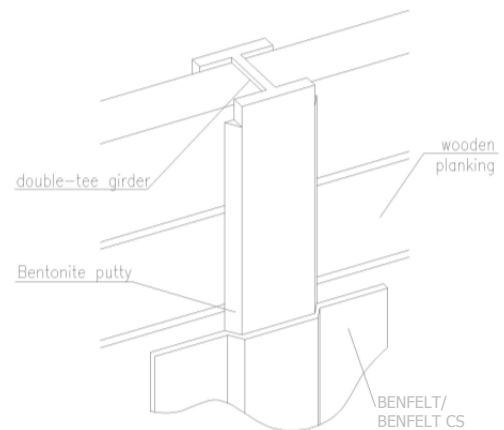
Bevelling with putty of the sharp offset between the girder shelf surface and the wooden planking of the excavation cover development.
